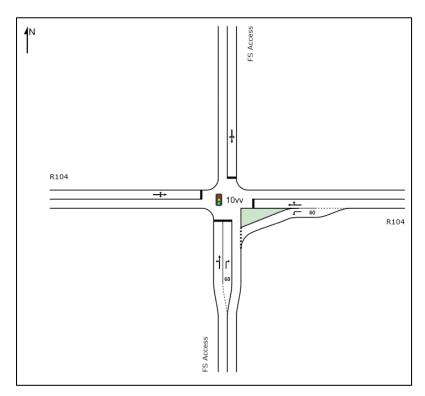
Intersection 10 Proposed Layout (2026 Background Traffic)
